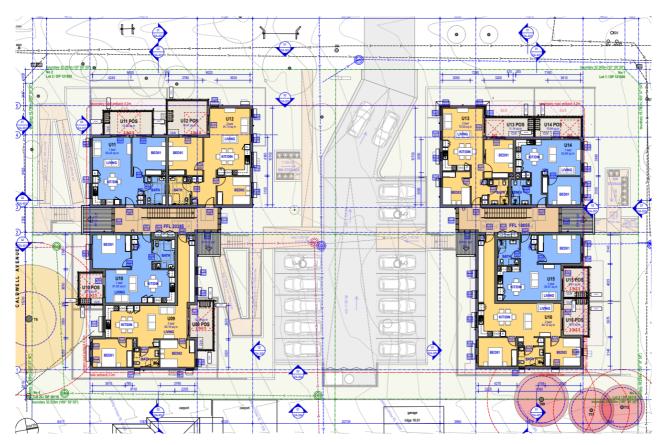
Extract from Architectural Plans – General Arrangement Plan – First Level (Source: Architectural Plans, Kennedy Associates Architects, dated 26/04/2023)
